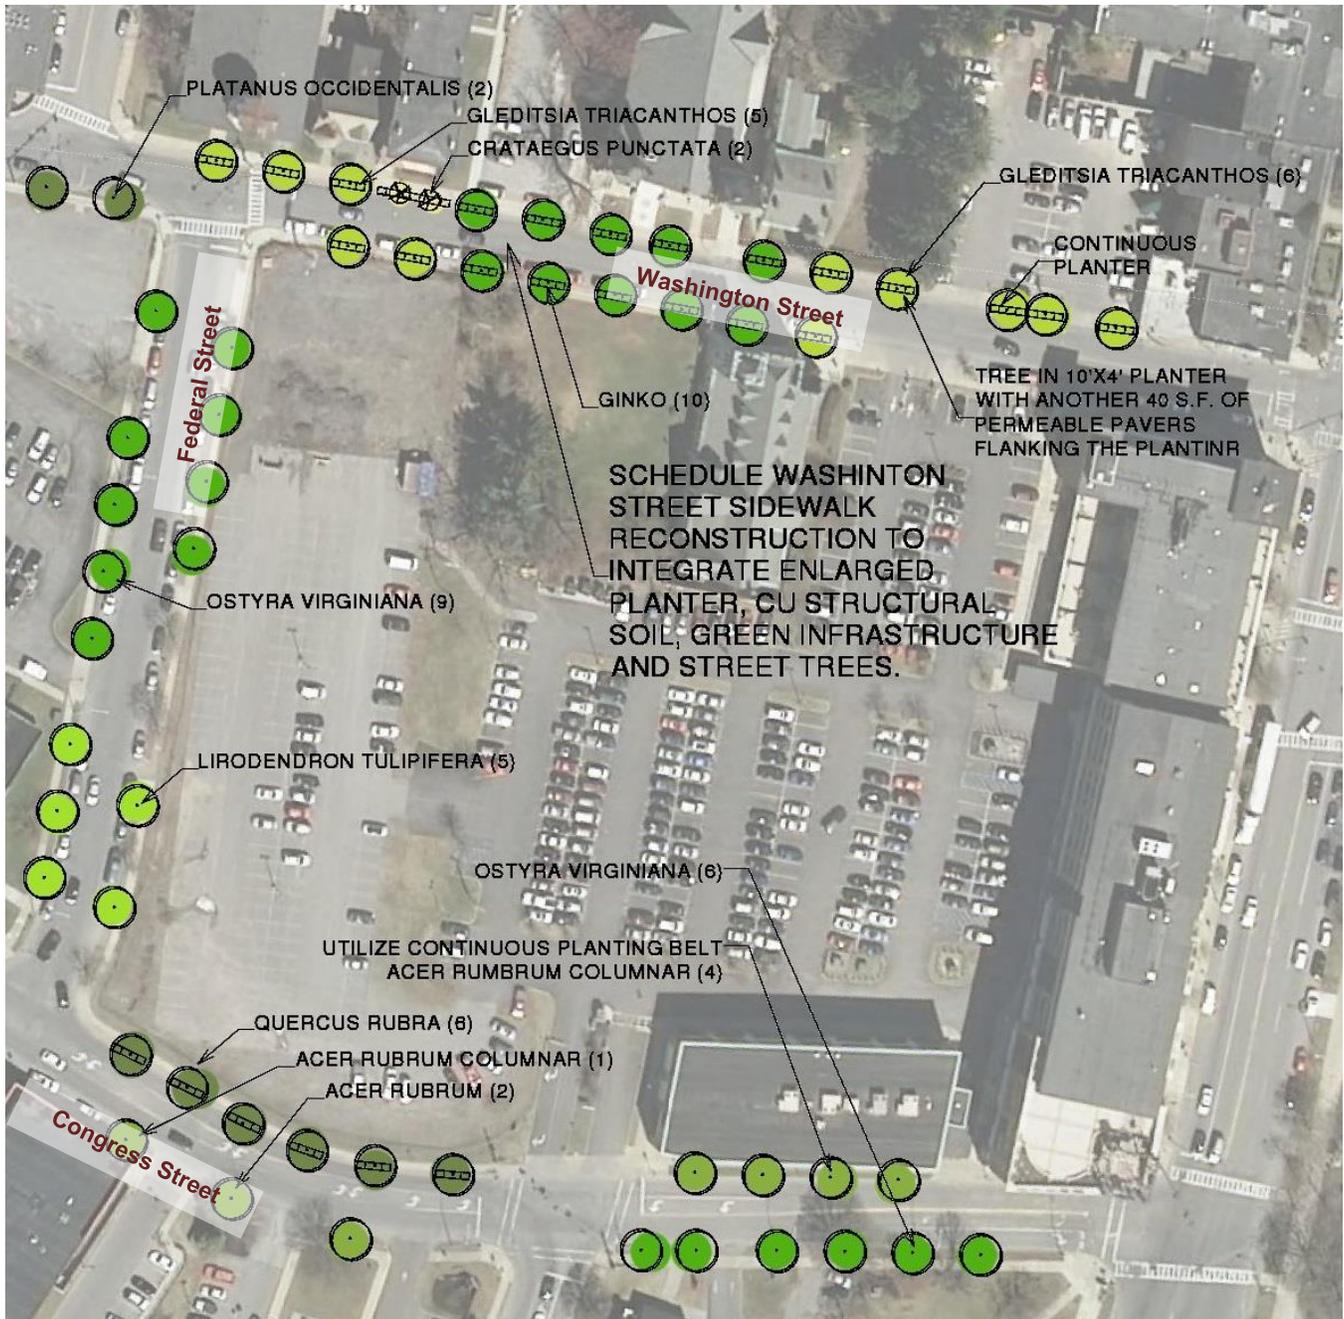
A sample planting plan of the Washington Street and Congress Street Block, including Federal Street. Congress Street and Washington Street are good opportunities to demonstrate the integration of pedestrian space, tree planting, and green infrastructure stormwater management techniques. Additionally these large parking areas offer a good opportunity for the City to engage in a public/ private venture by adding trees in and around these parking facilities.
